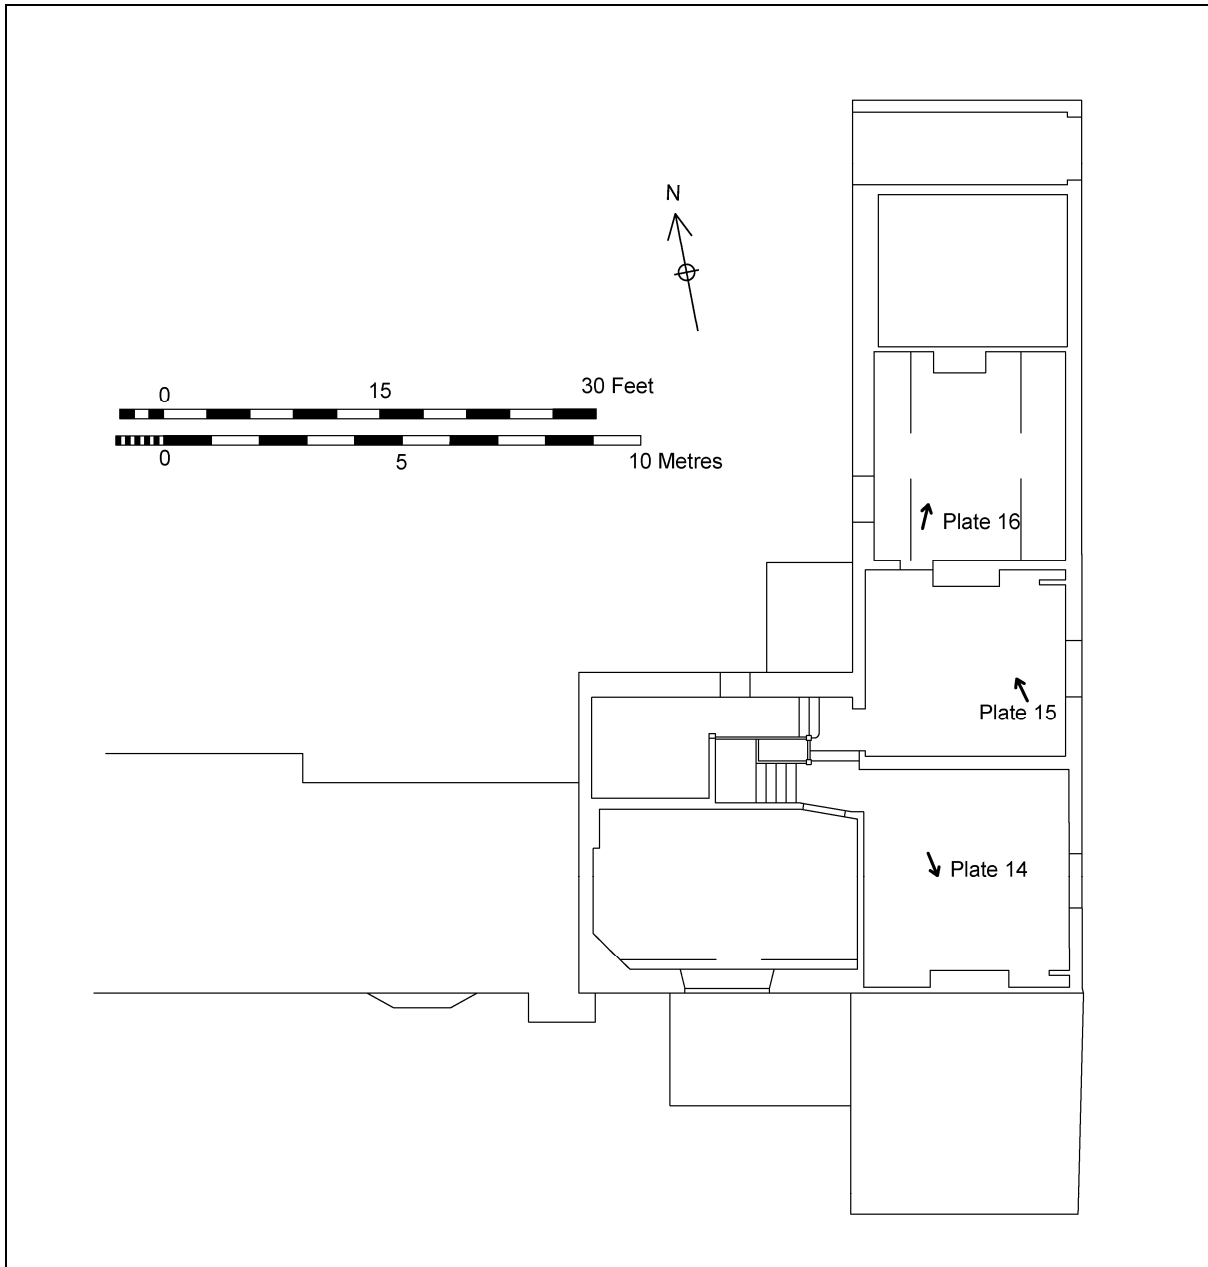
Farmhouse, first floor, with location of plates 14-16.
